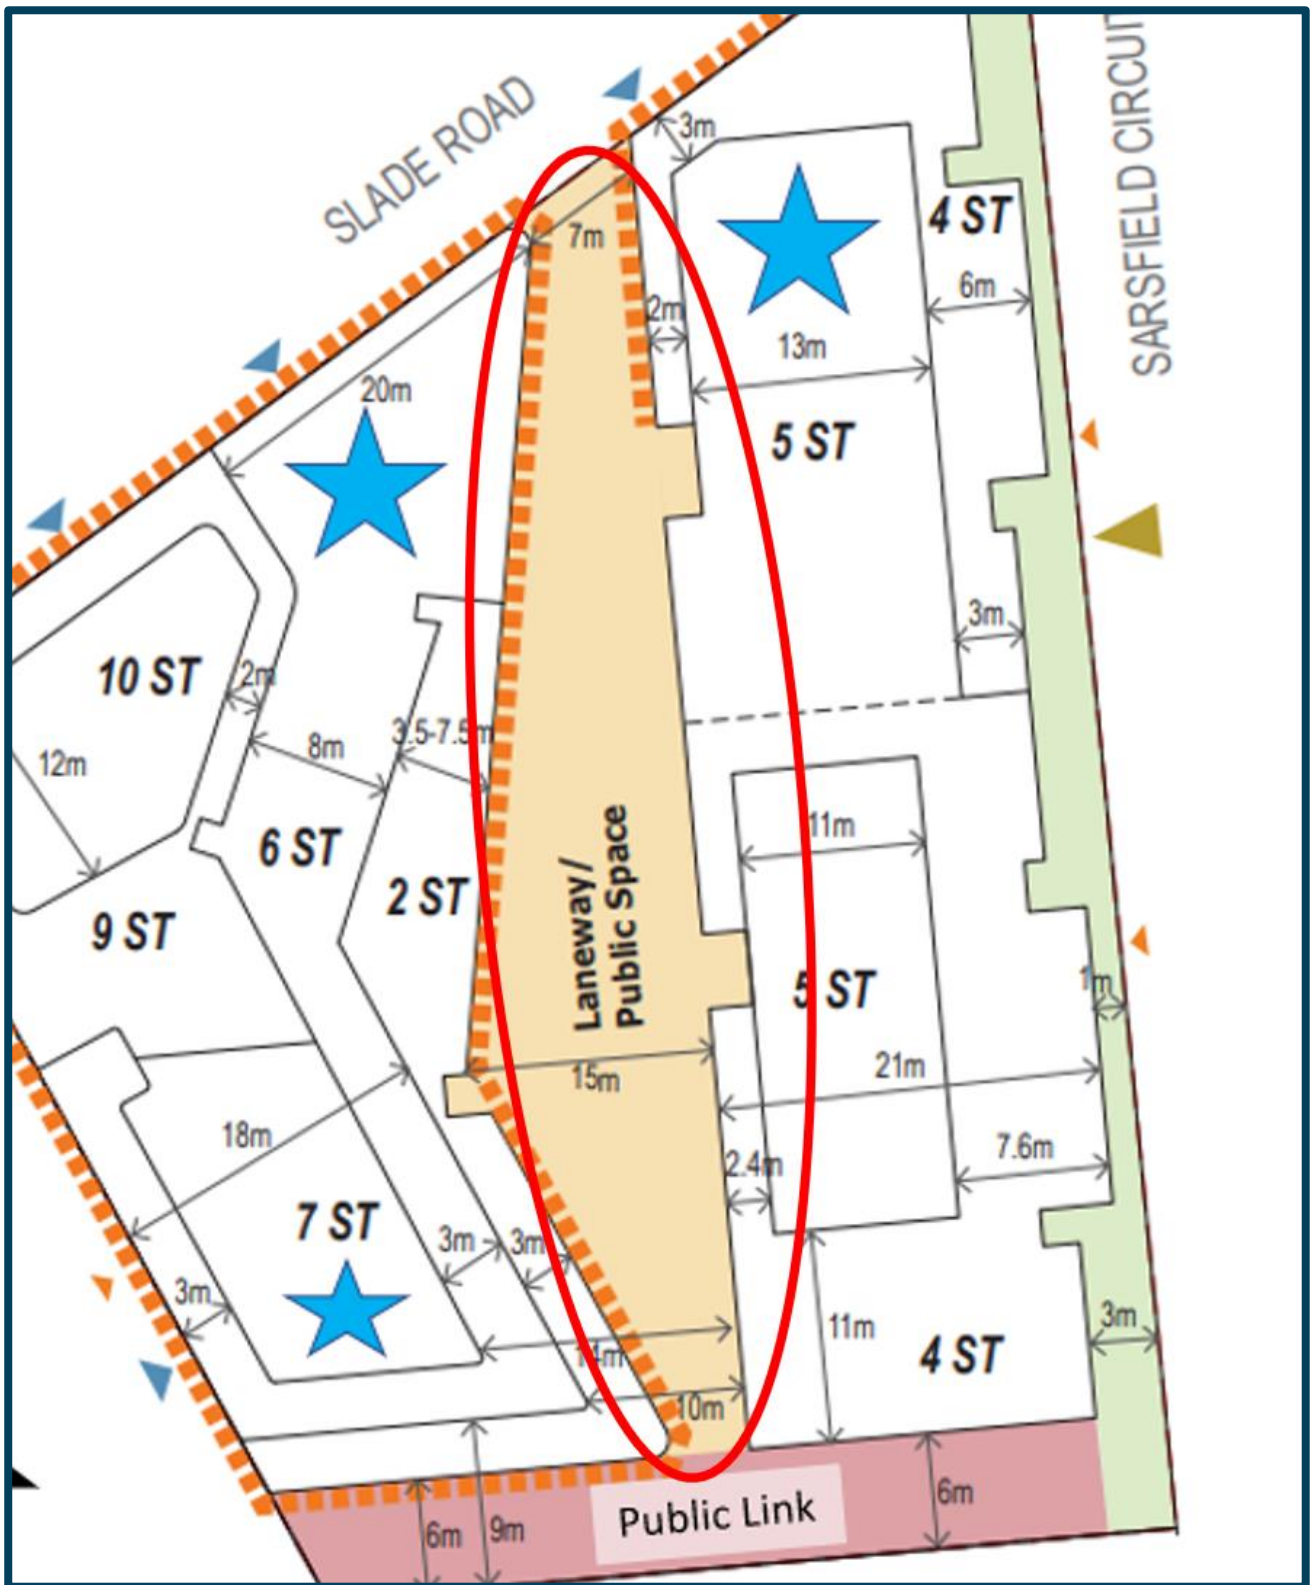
Proposed publicly accessible laneway/open space in the centre of the site (Source: UDR)
